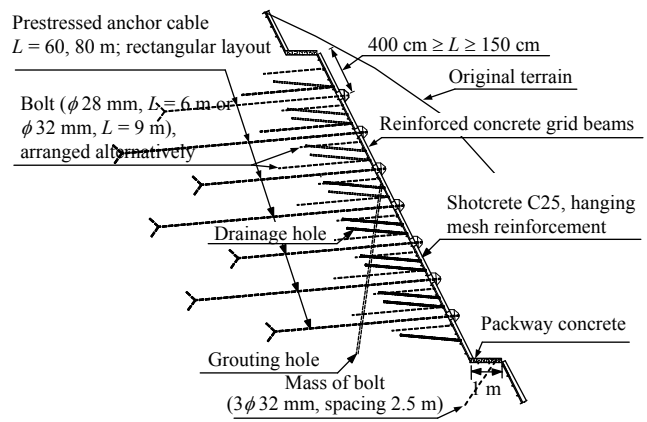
Reinforcement layout for the shallow and surface rock masses.
